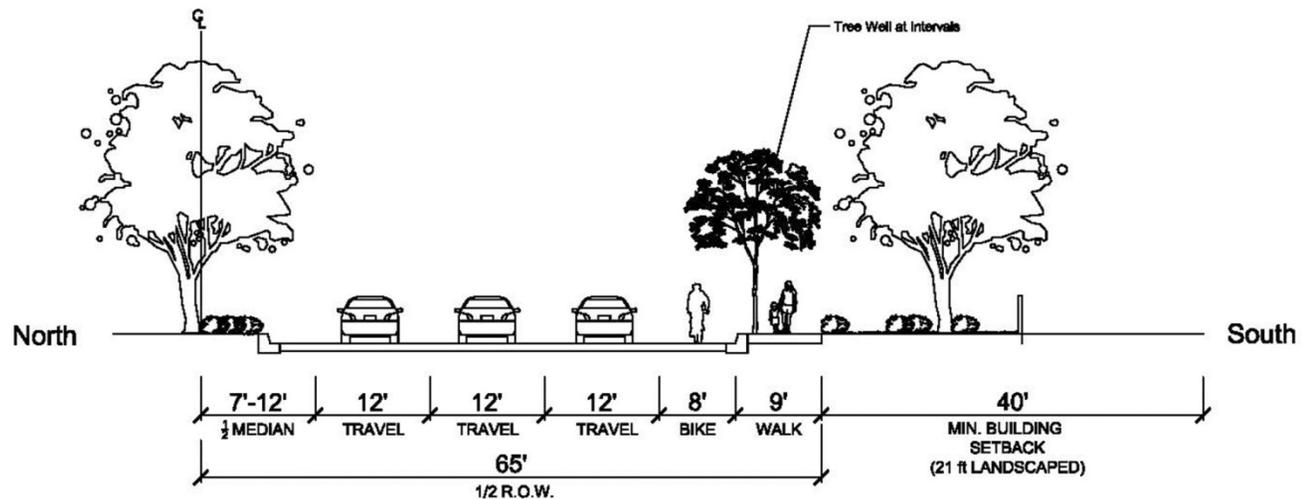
Edinger Avenue – Eastbound from Kensington Park Drive to the Santa Ana – Santa Fe Channel
